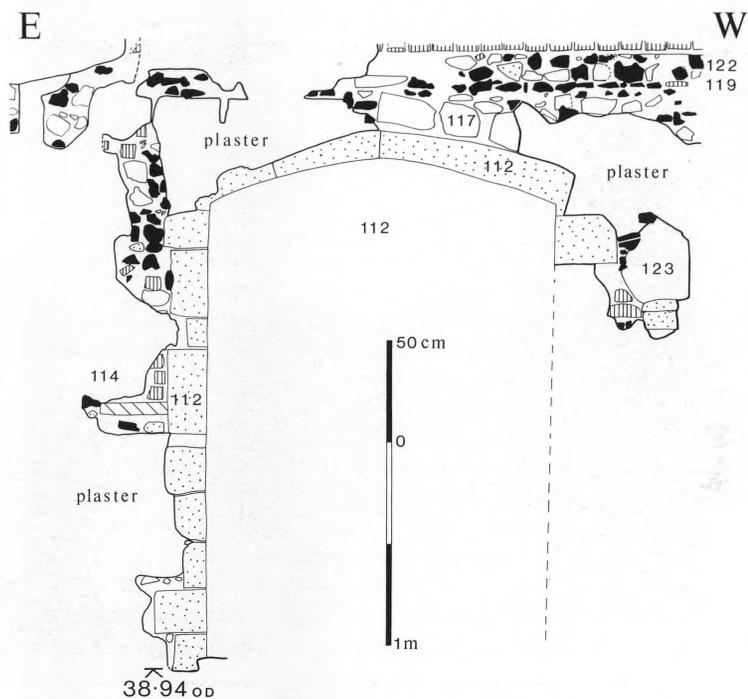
Carshalton Church: outer south aisle interior, south wall, west bay, elevation. For key diagram see fig 5.
